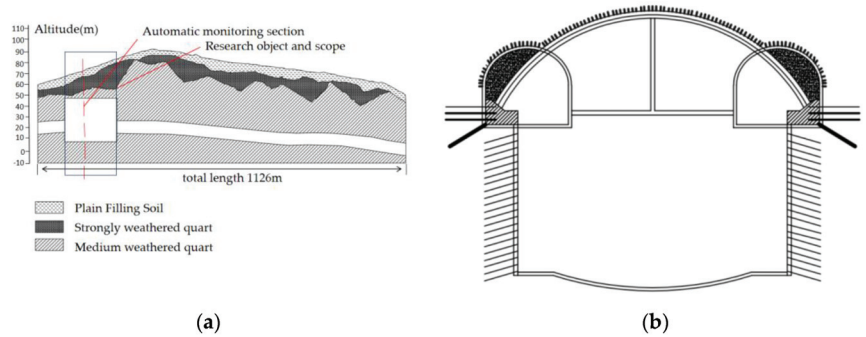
The longitudinal geological profile and the station cross-section: (a) the longitudinal geological profile; (b) the station cross-section.
